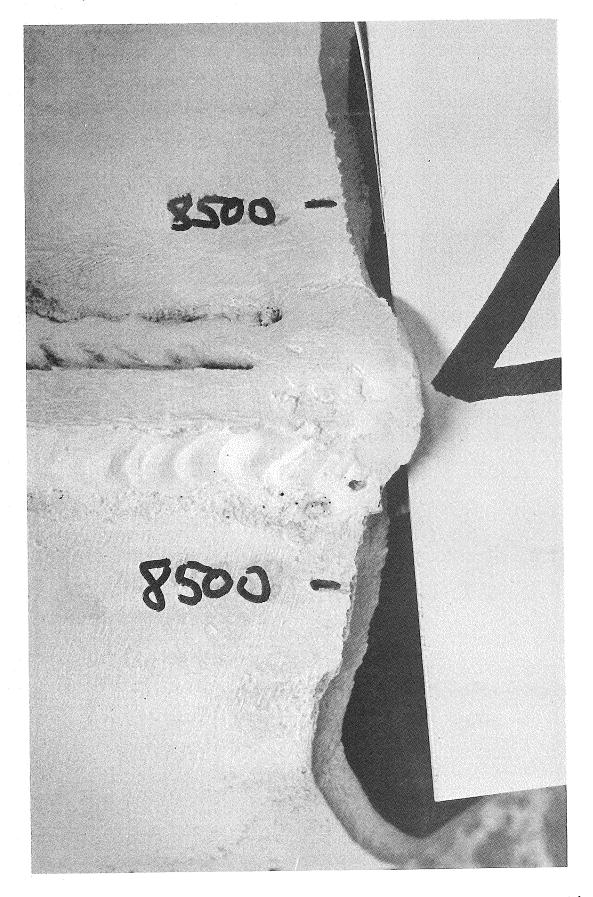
JOINT TYPE 3- SPECIMEN No. 4 (TAPERED GUSSET PLATE)
